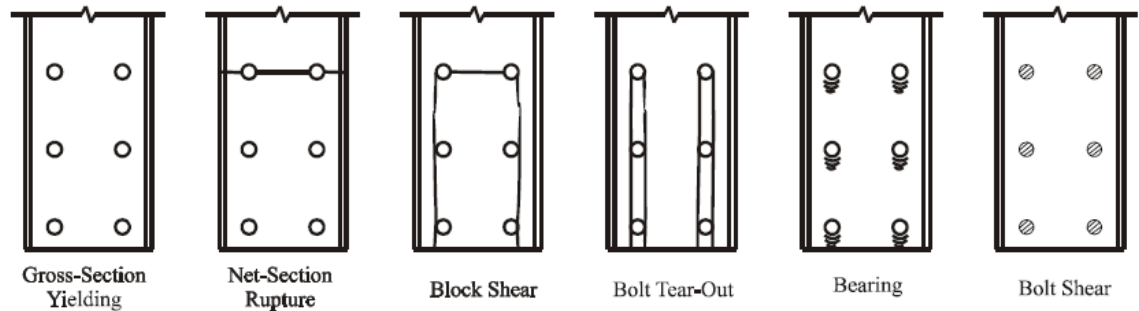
Conventional connection failure modes (Cai et al. 2008).
